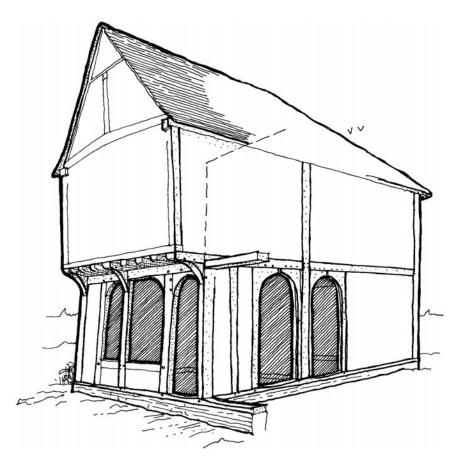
Isometric reconstruction of 7 Queen Street (corpus no. 82) (not to scale)
